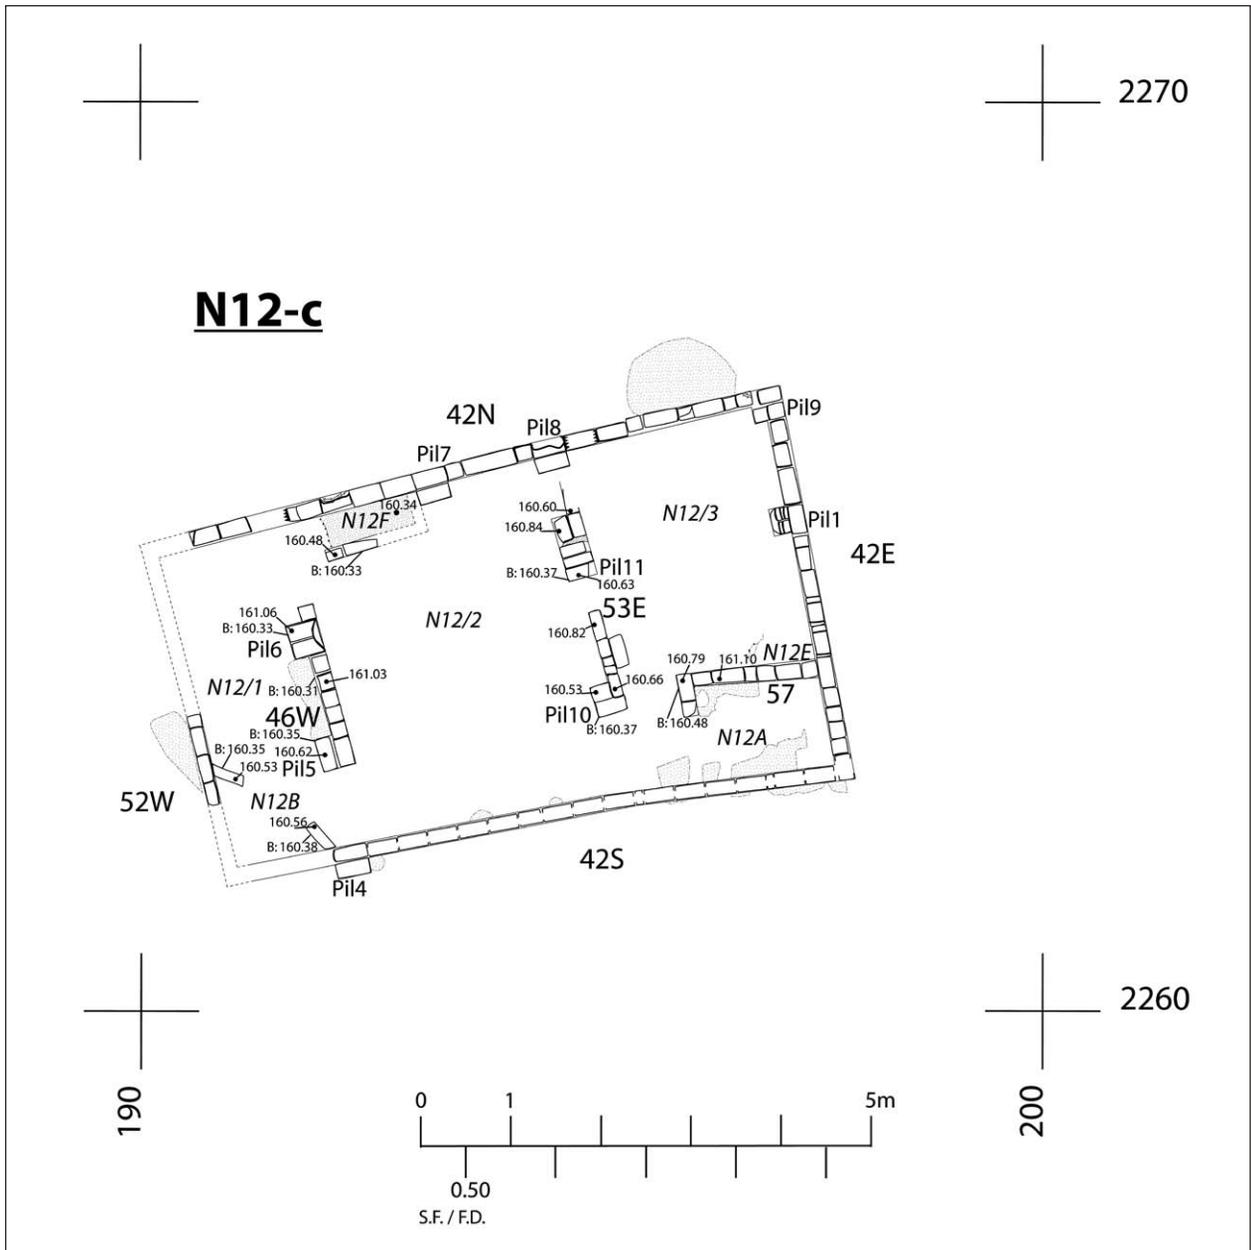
Plan of Phase N12-c: levels of the internal walls
